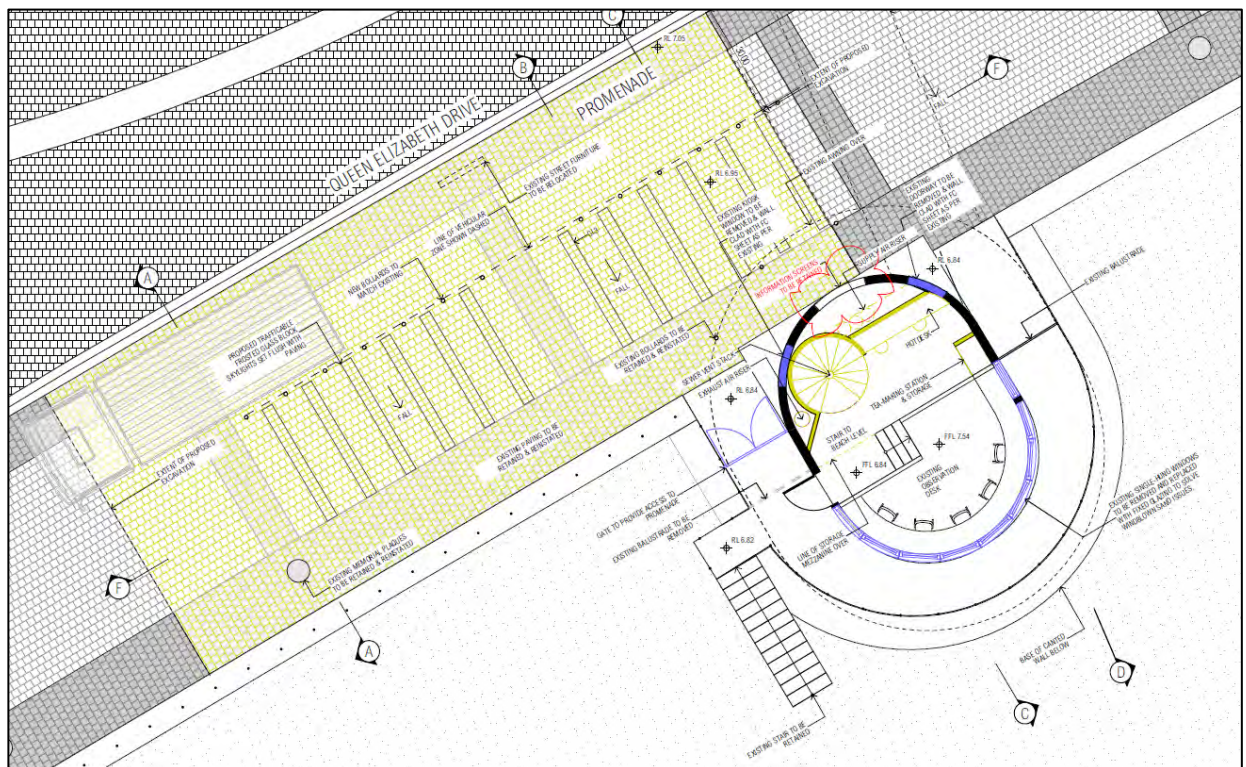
Proposed modifications to beach level floor plan of Lifeguard Tower and Tunnel 2 (demonstrated in blue). No physical changes are proposed to Tunnel 2 as the plans submitted with the modification application only demonstrate these works to be allocated to Stage 1 of the approved development.
